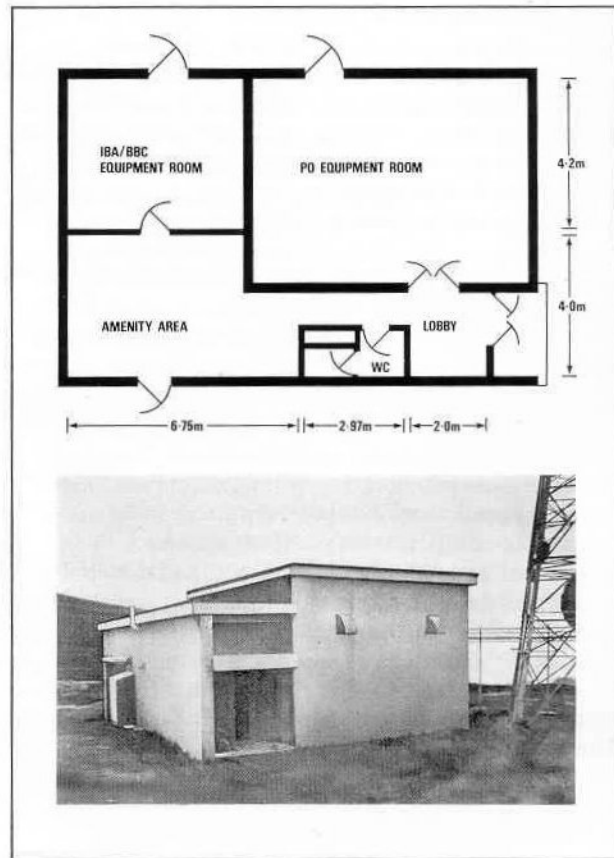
As part of the conversion, the area between the blast wall and the main building has been roofed over to form an apparatus room for IBA/BBC equipment, and an amenity area for common use. The original generator room has been allocated to the Post Office. The photograph shows the building shortly before the work was completed.
